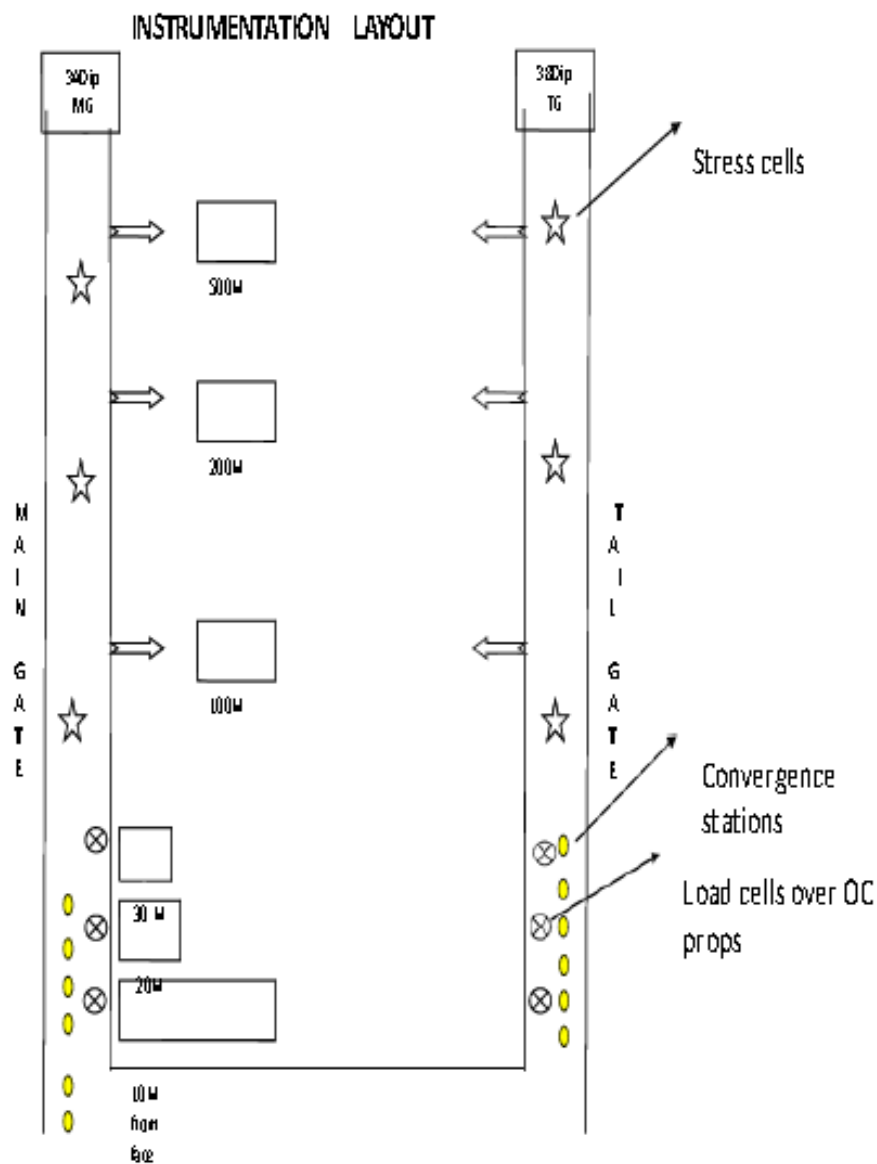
Instrumentation layout for Longwall panel 3D
